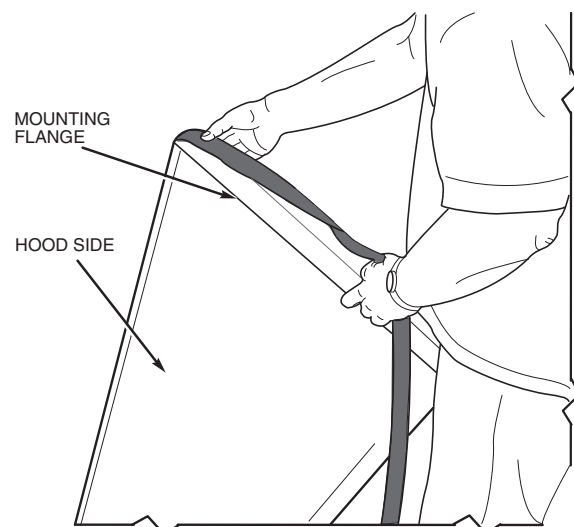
Adding Seal Strip to Sides of Hood Top Mounting Flange
